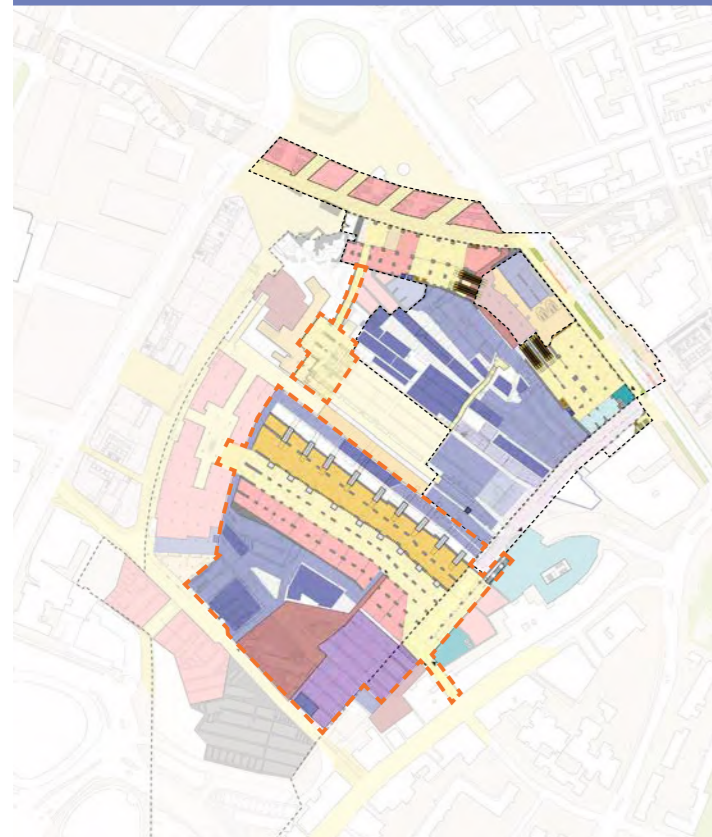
Grade / Undercrofts Level Sketch Plan
